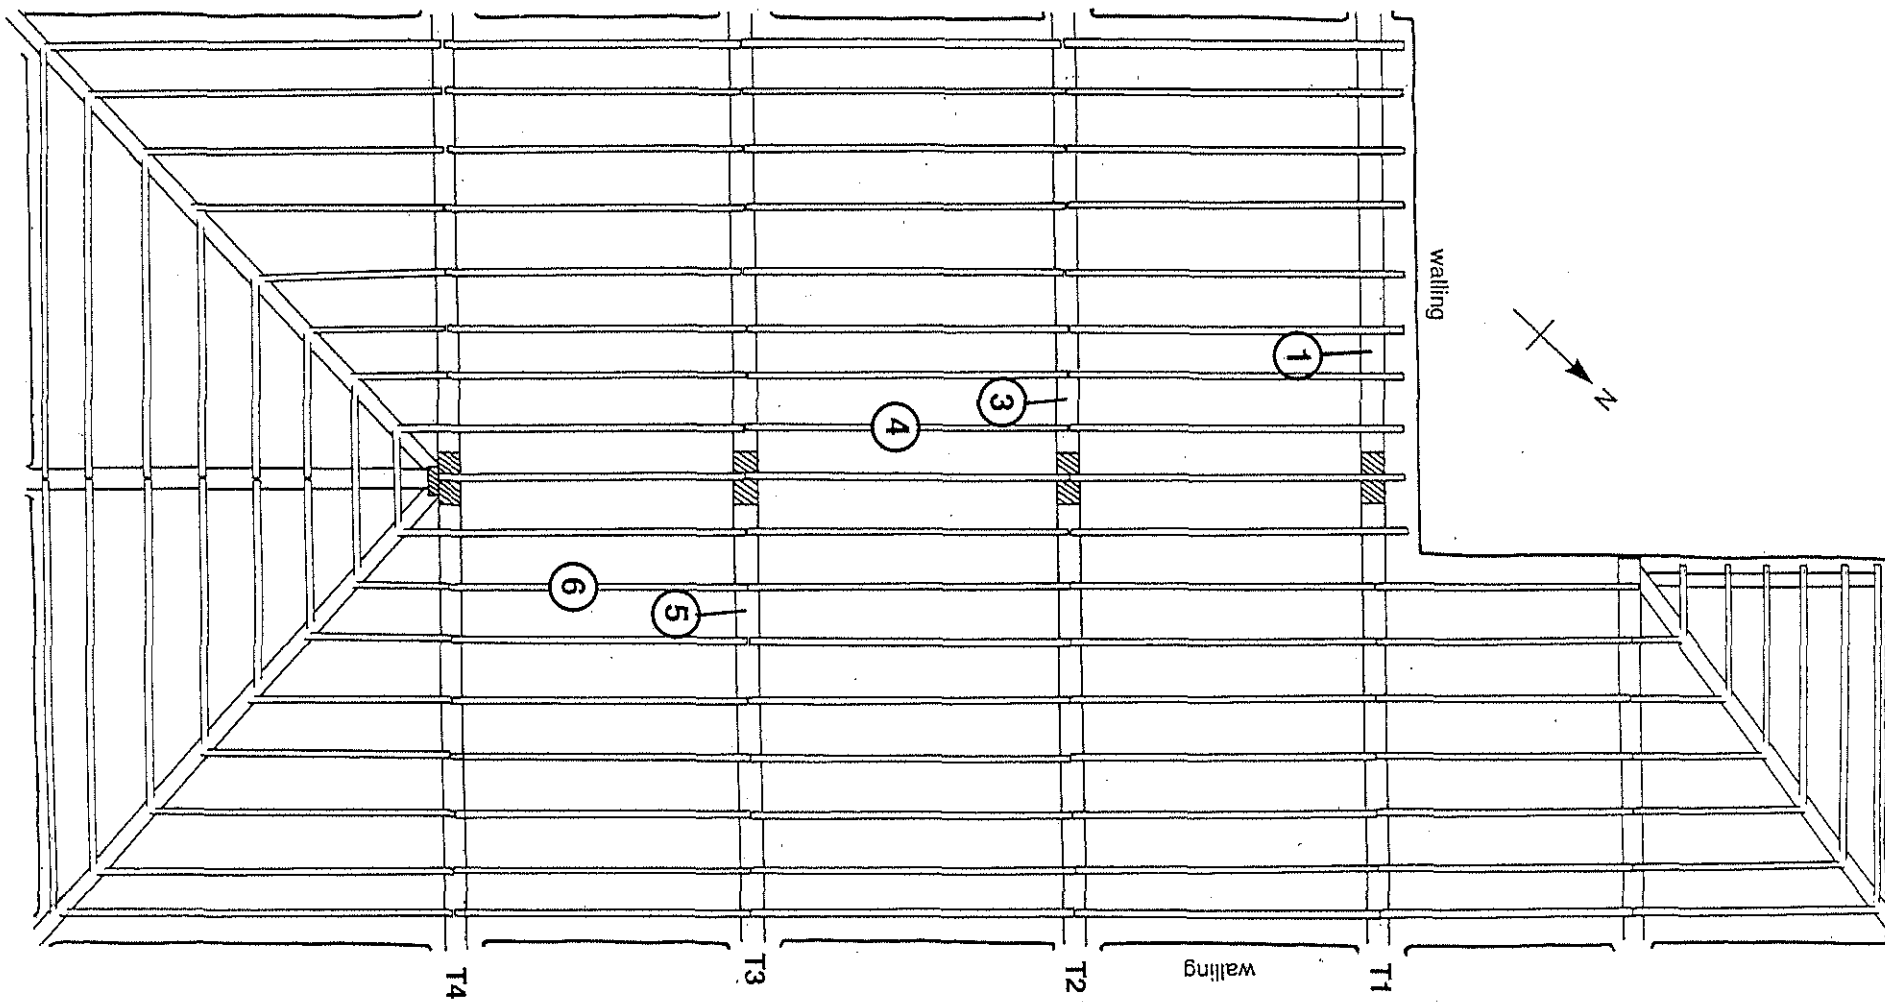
Bolsover Castle, west roof of Little Castle; plan of tiebeams and joists to show position of timbers sampled
